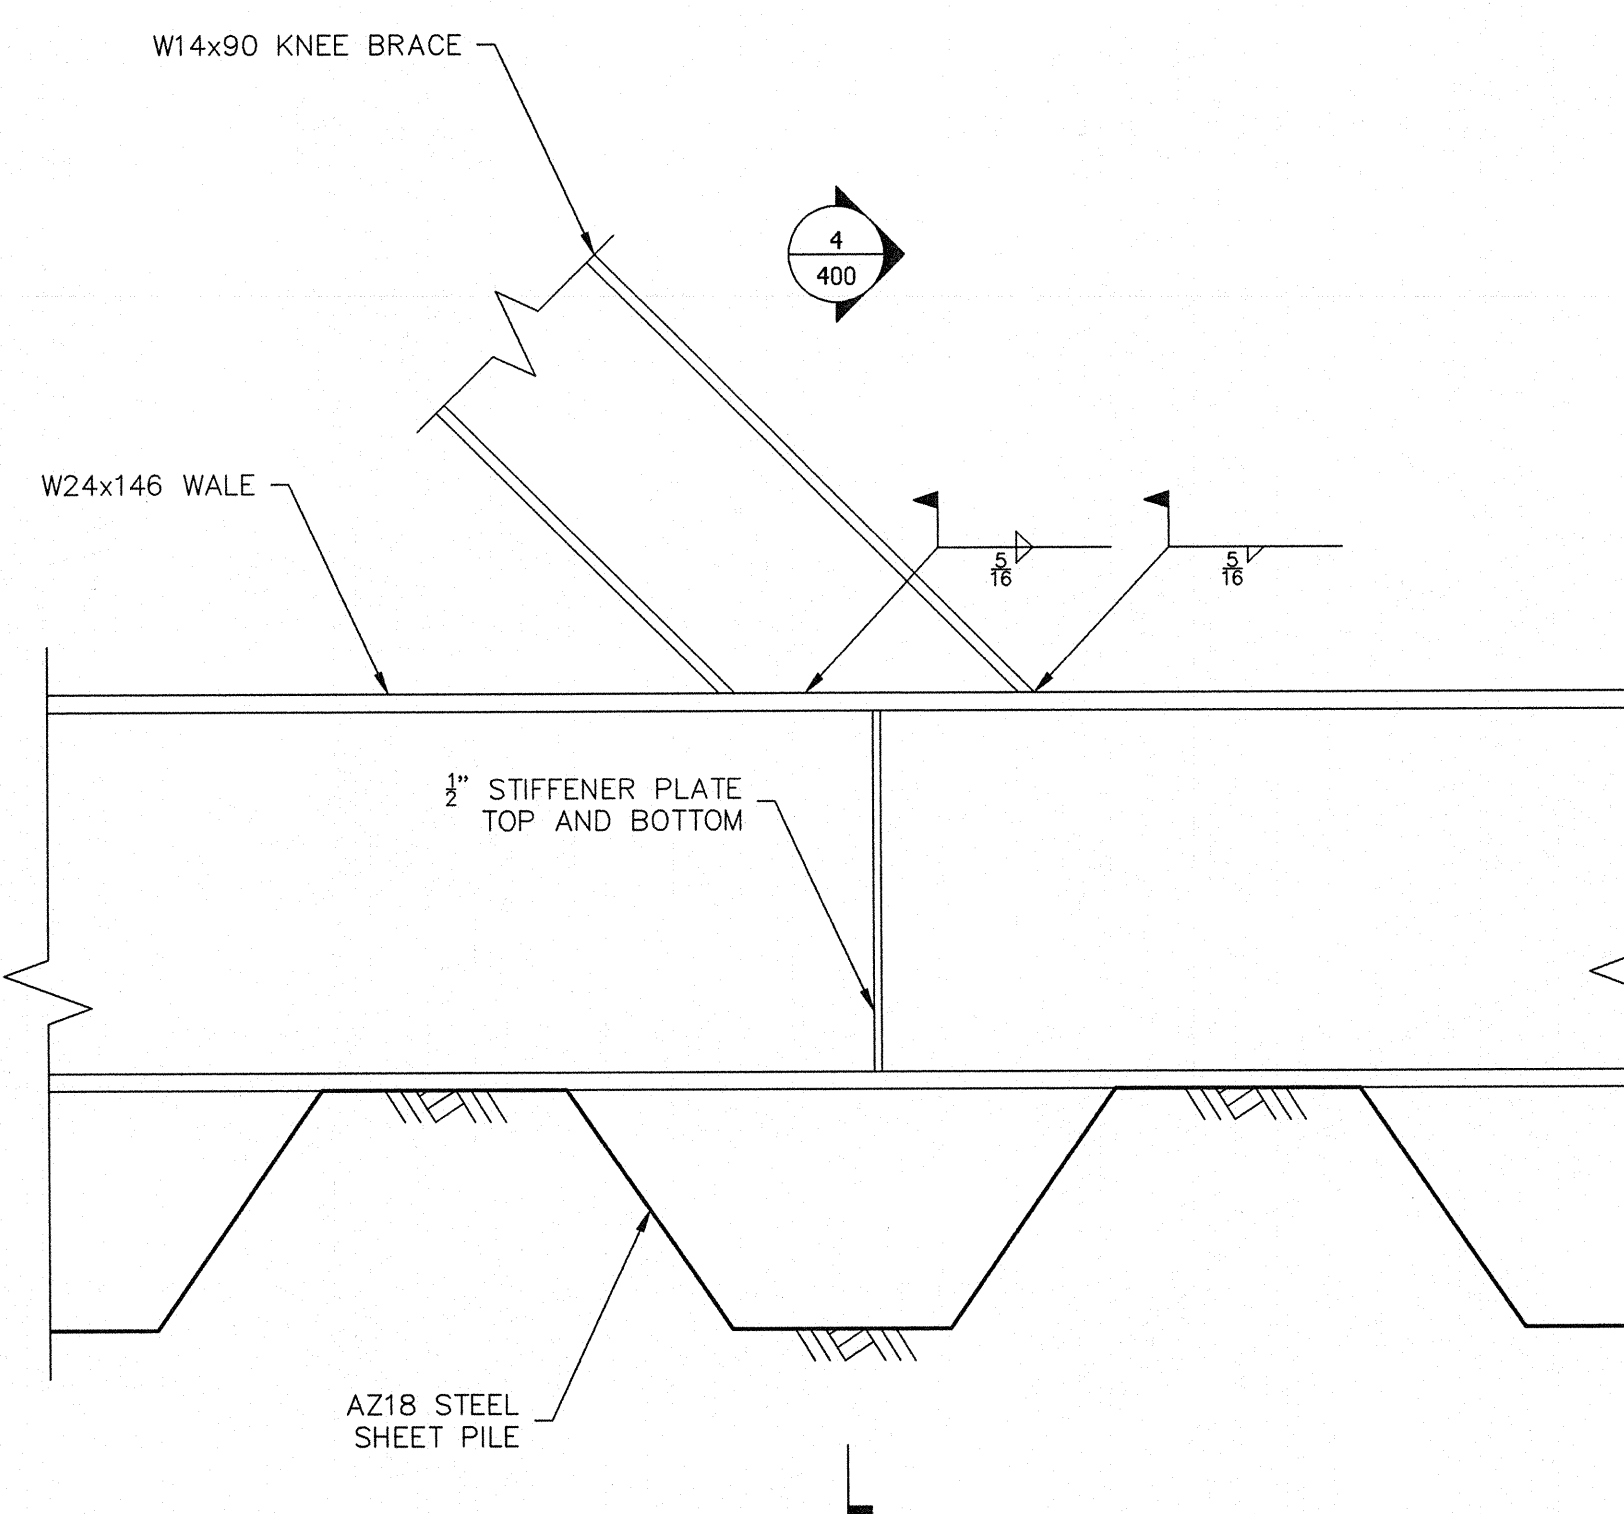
TYPICAL WALE CONNECTION @ STRUT (PLAN VIEW)
